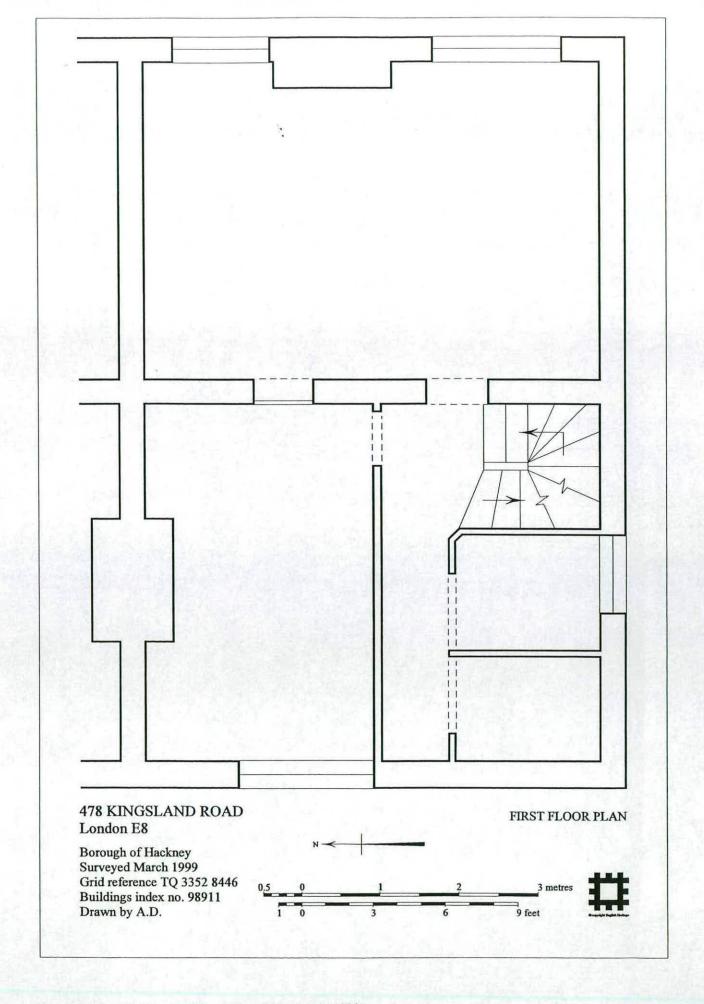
No. 478 Kingsland Road, first-floor plan in 1999.
